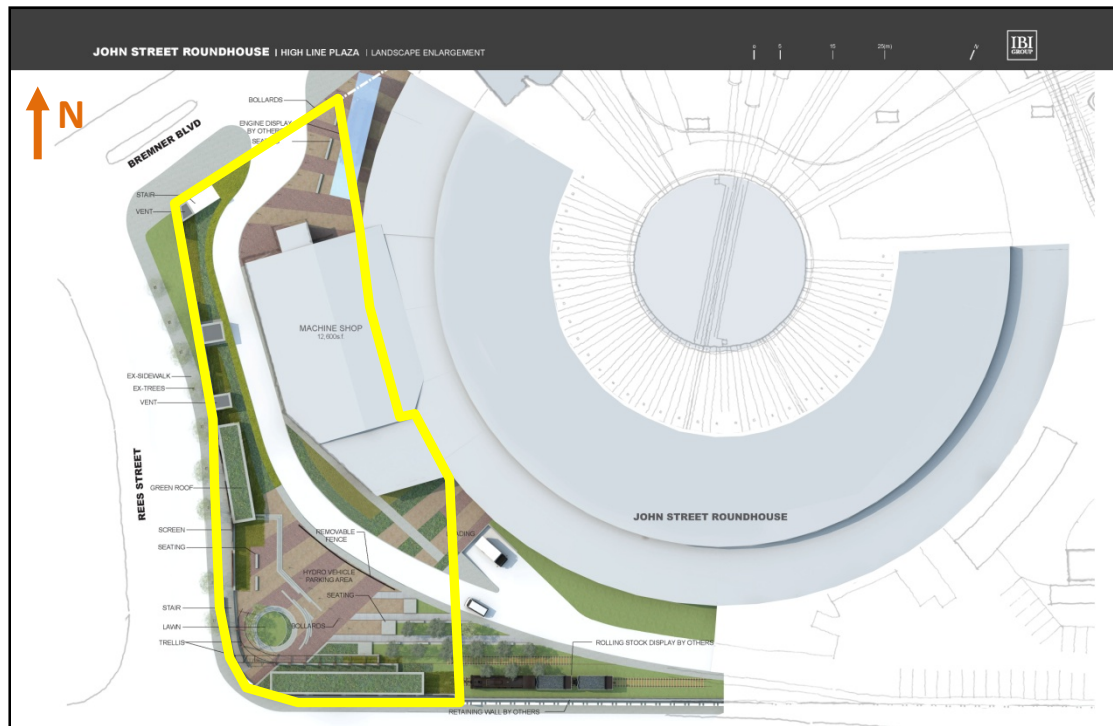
Plan Layout of Bremner TS Site (highlighted in yellow)
